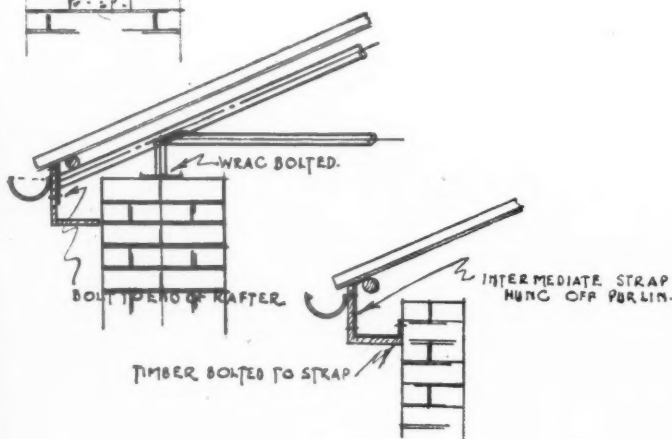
Truss wrag bolted and with gutter strap suspended from purlin.
